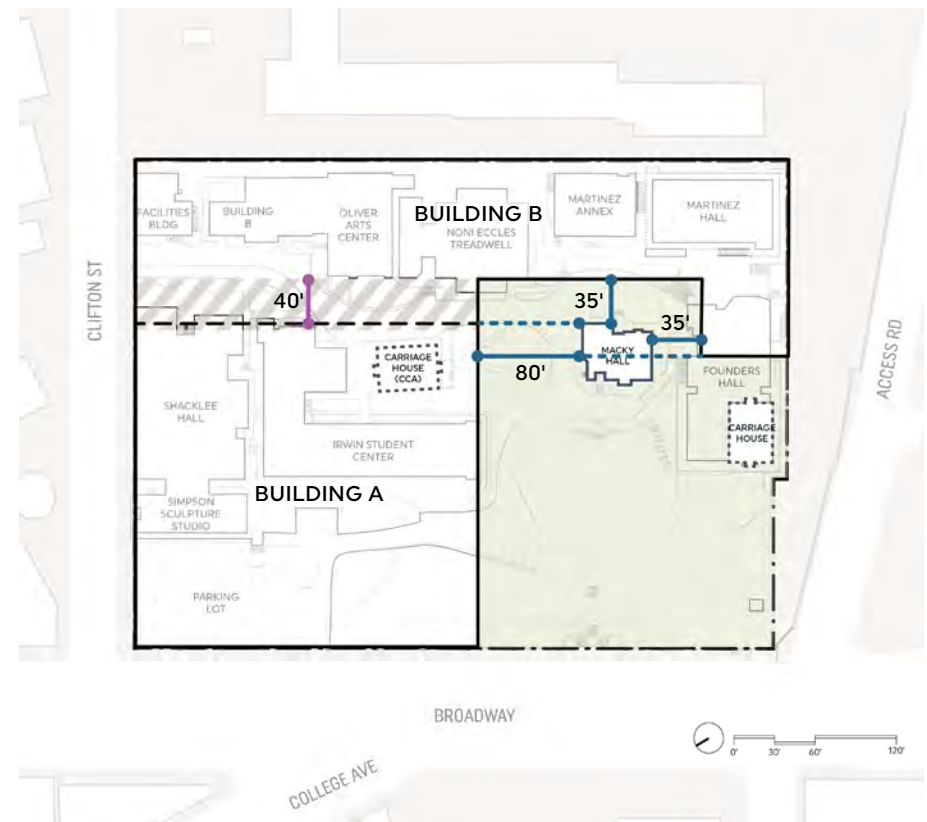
Building A and Building B buildable area boundaries over existing siting
